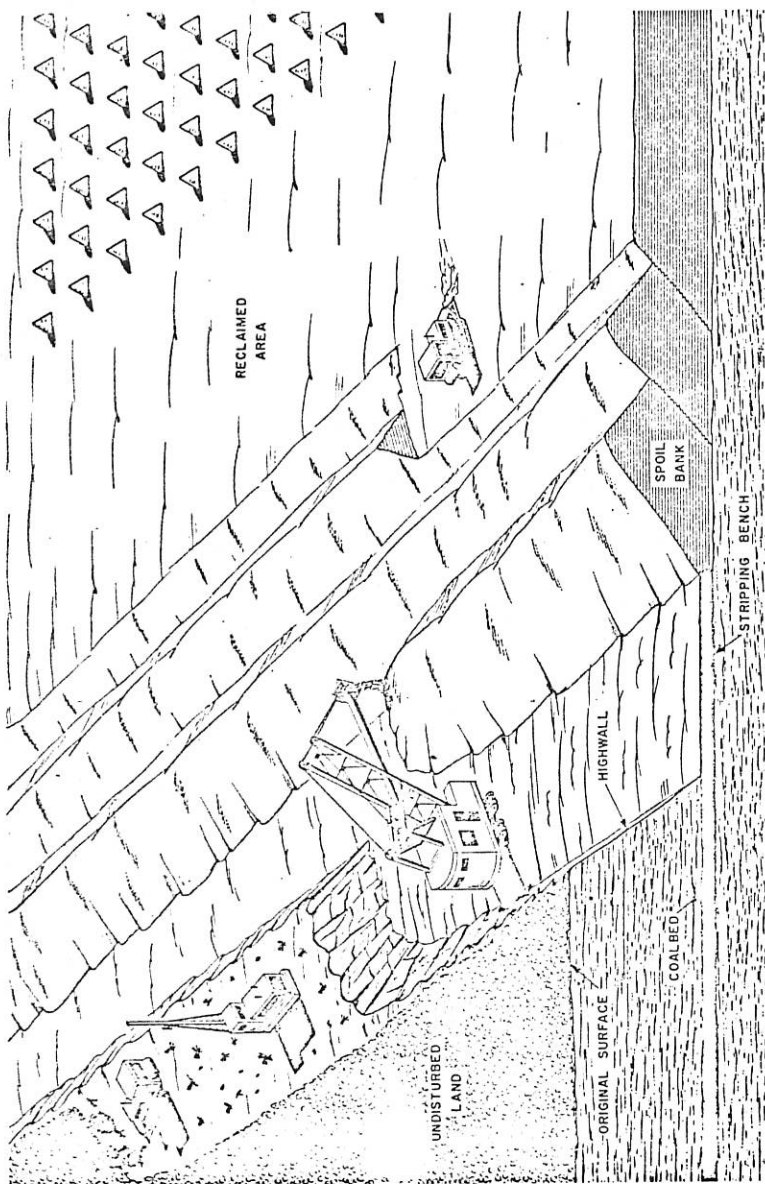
Area Strip Mining With Concurrent Reclamation.
